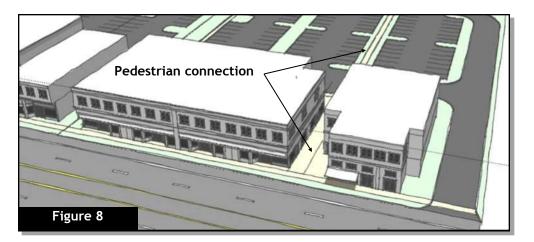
depicts a single, large property on which two structures are built, each sharing a parking area in the rear. This concept also provides a common pedestrian network and plaza space that connects each building entry with the common parking lot and the street.
